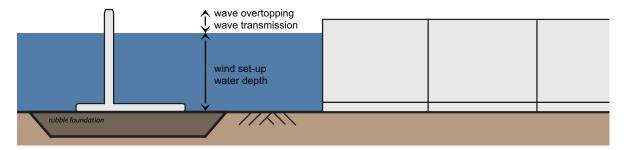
Cross-sectional View (left) and Side View (right) of L-wall Breakwater
